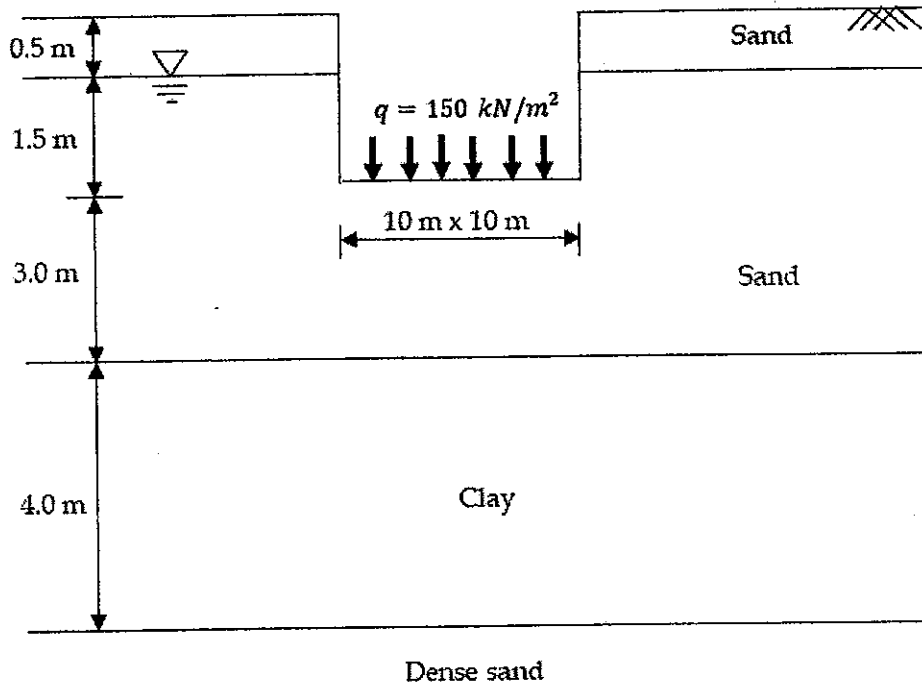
Subsurface soil profile and foundation arrangement
